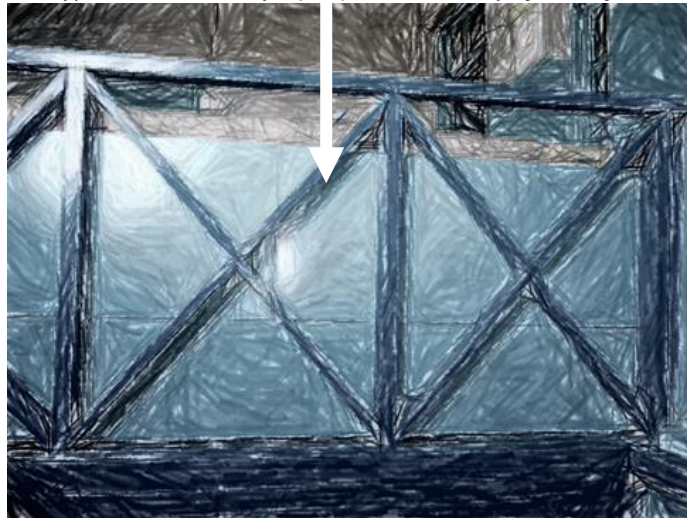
Dej. Haile Selassie Gugissa residence interior staircase wooden handrail, constructed in the early 20th century,
